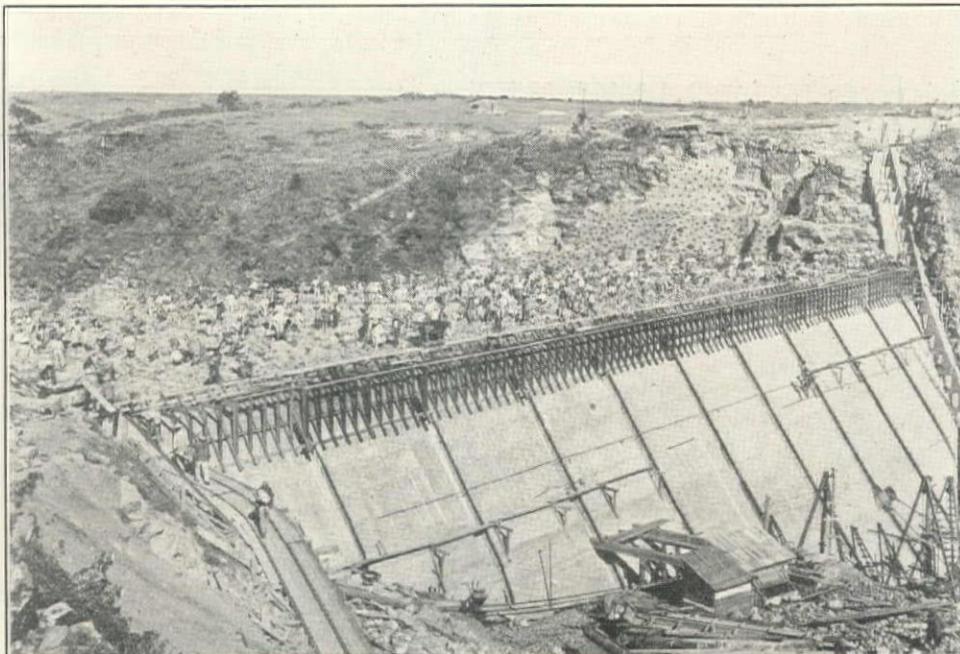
TEPUXTEPEC ROCKFILL DAM LOOKING NORTH, SHOWING UPSTREAM FACE AND CUTOFF WALL
